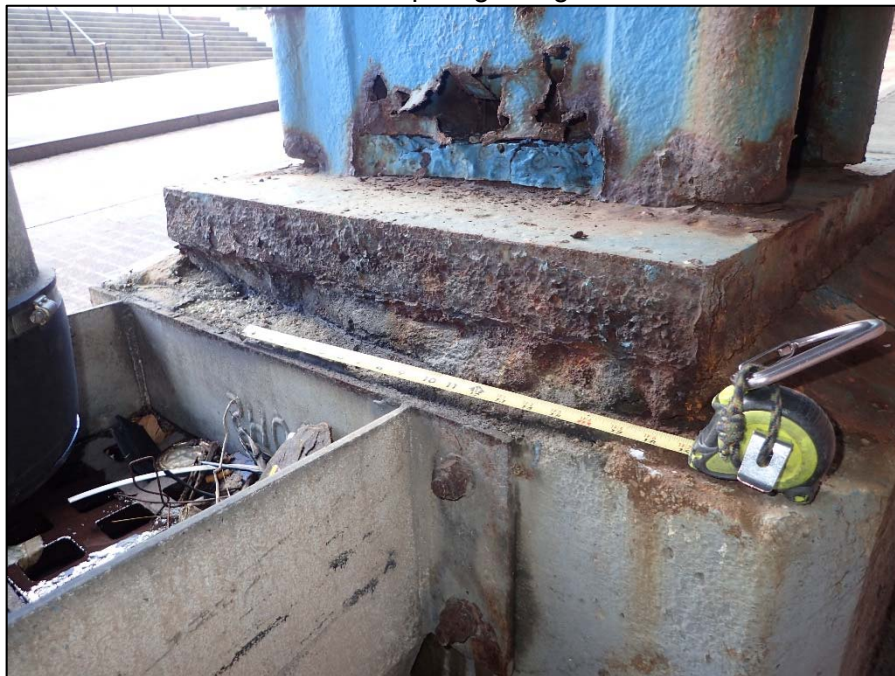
Unit III, Frame and Braced Column, Bent 4; North column has a Full Length x 3" H x up to 1" D spall with 1/2" D undermining
